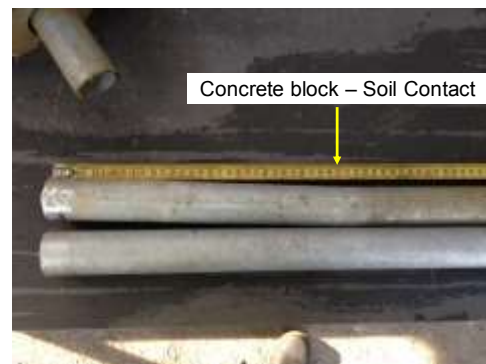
Shape of the steel tubes excavated after testing. The kink at the critical section can be noted.
